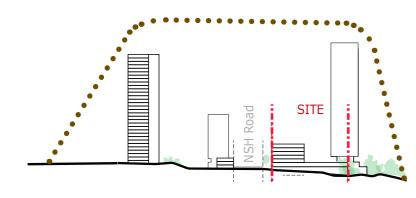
Principle sections through the sequence along New South Head Road with streetwall buildings and tower forms setback from street alignment.
